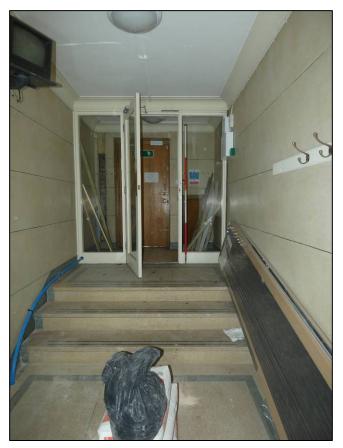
Staff entrance (GF6), interior, looking W (photo 922).
